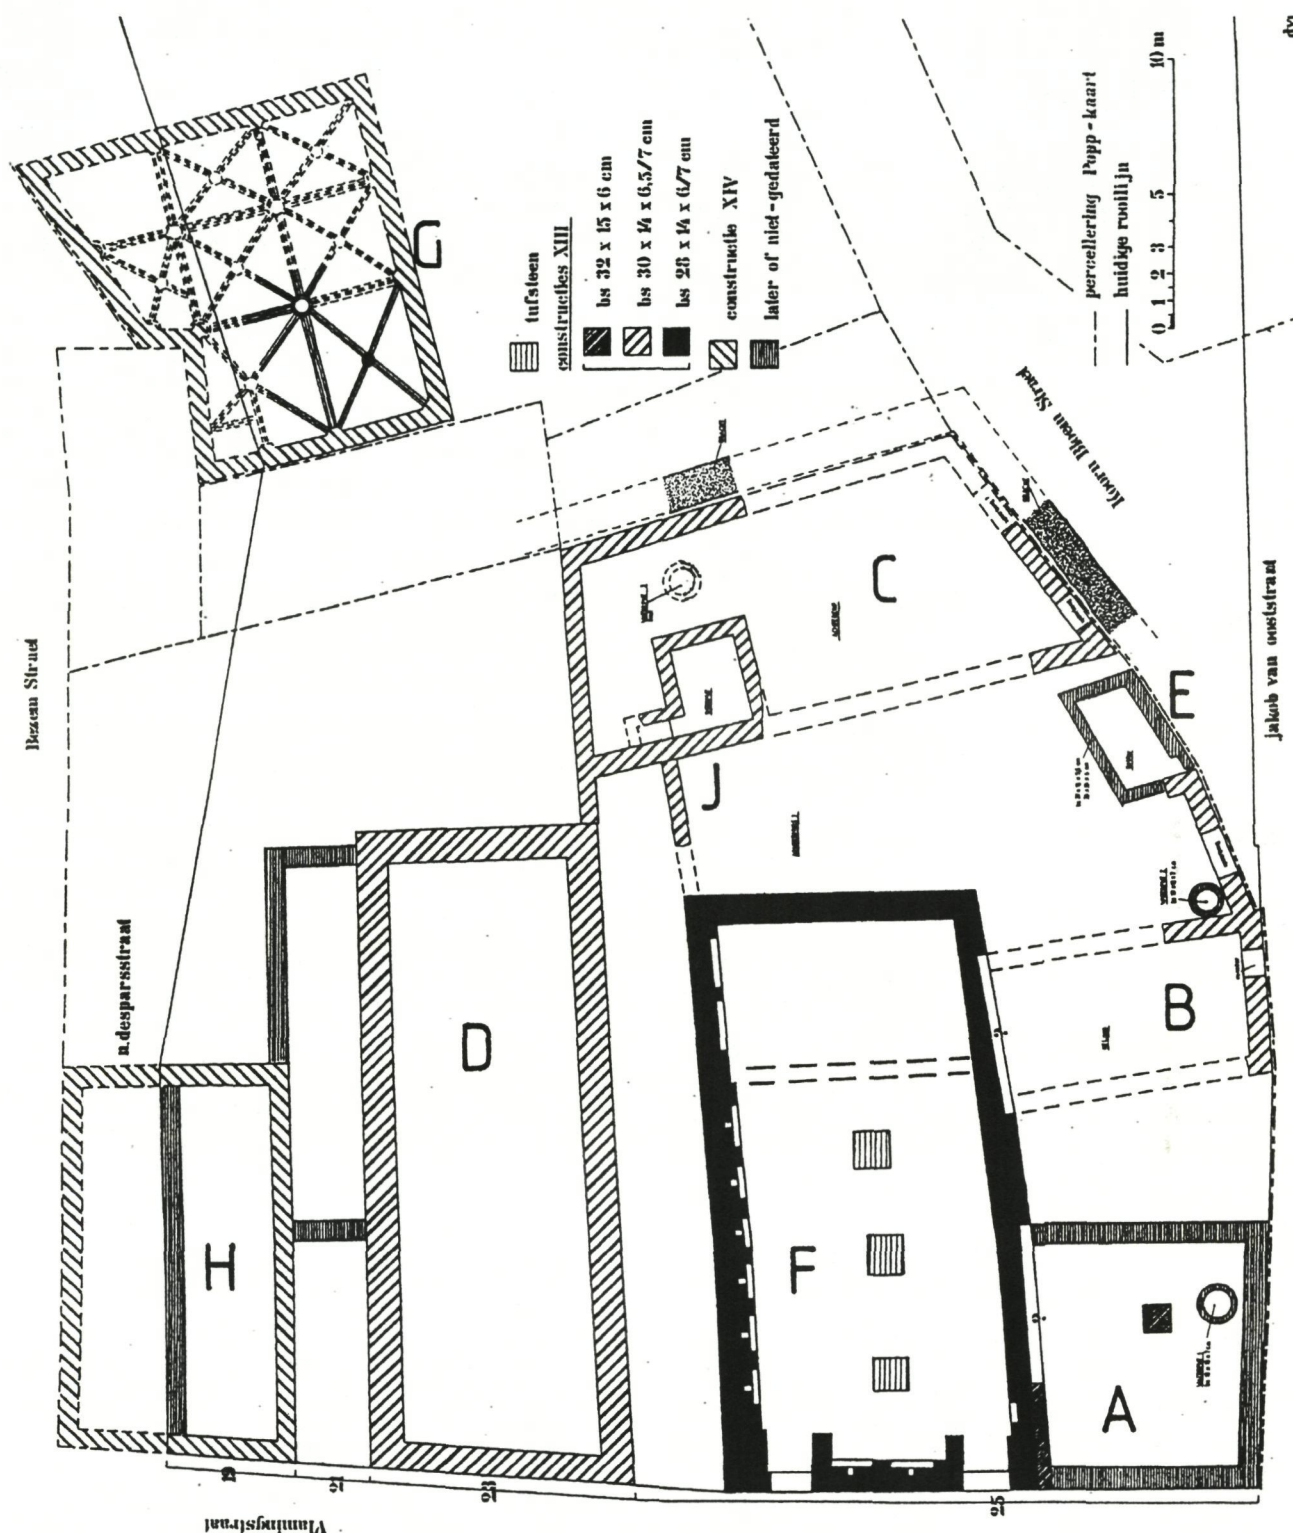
General plan of medieval buildings on the plots Vlamingstraat 19-21-23-25.
